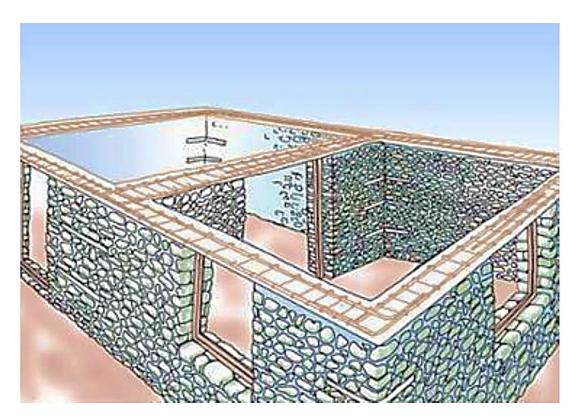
Masonry Wall Strengthening Proposed for Low Strength Masonry (NBC203-1994) (Sketch: NSET)
